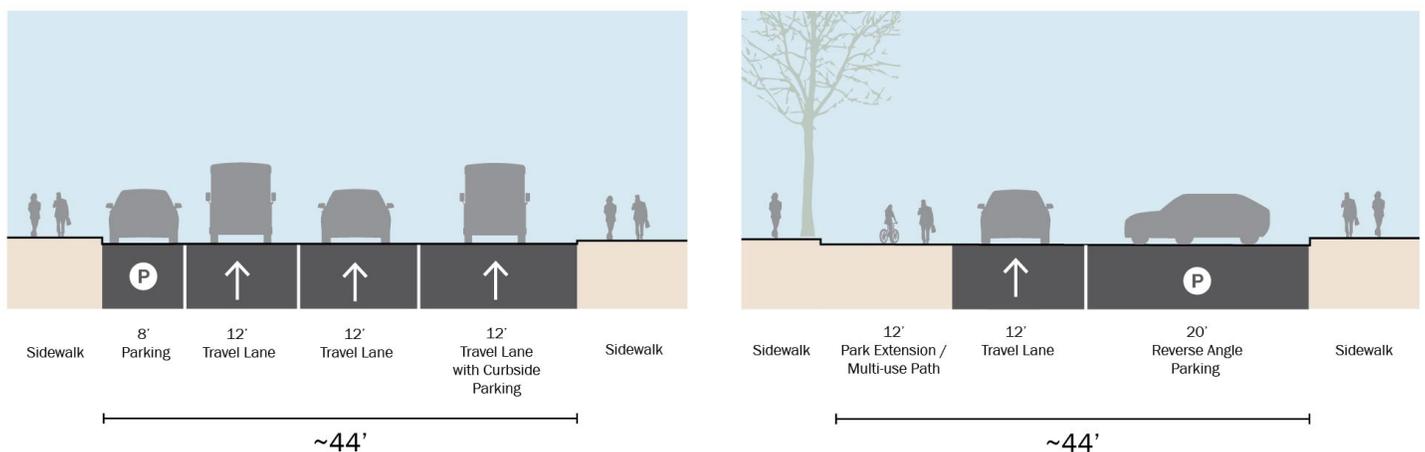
Existing and Recommended Cross Section of Park Place (looking north)
